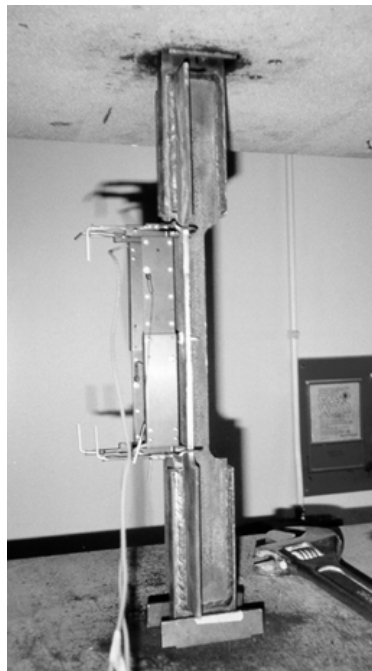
Orientation of Double Angle Specimens in the Testing Machine
